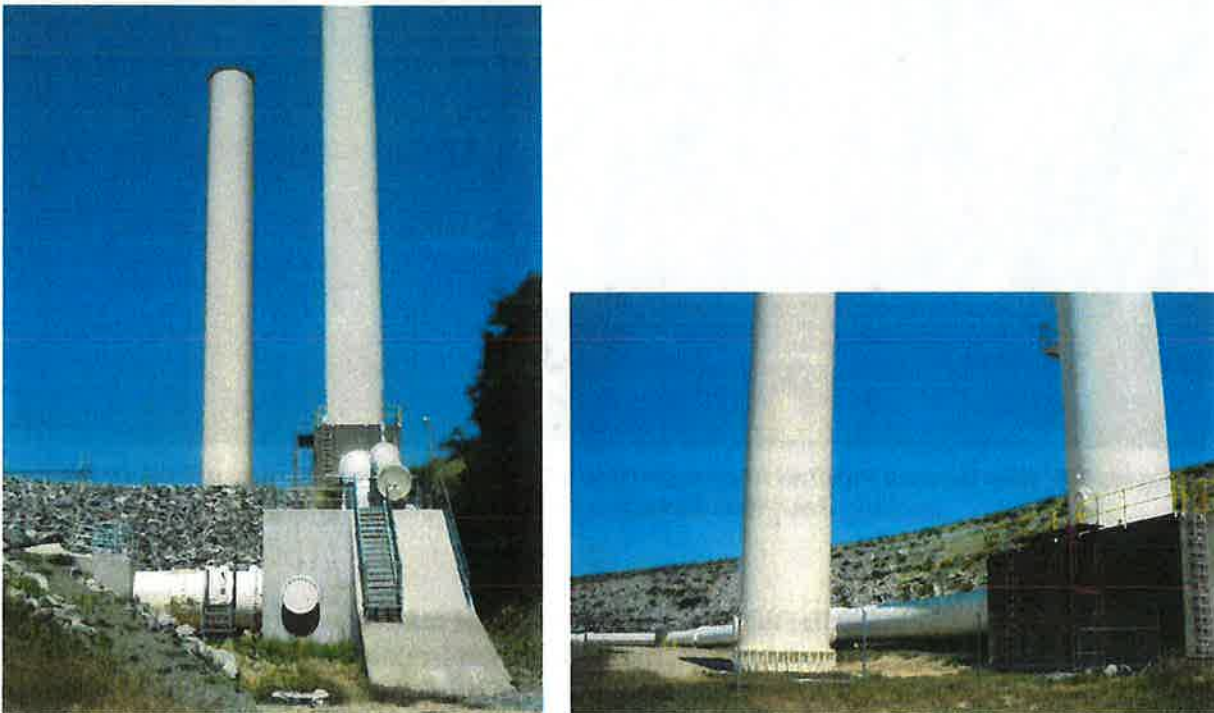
Connection to New 72-inch-diameter Pipe (Picture on Left); Standpipes on Above-ground and Underground Pipes (Picture on Right)
